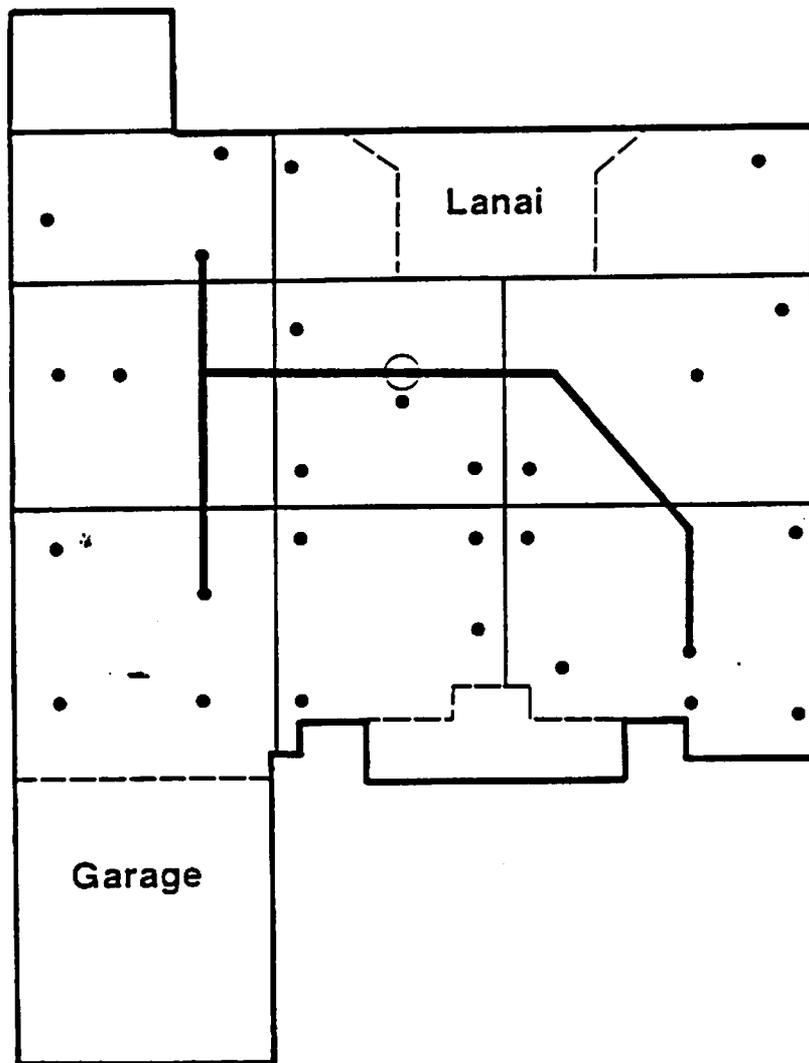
House #3 footprint, with mat layout, interior footer and measurement point location.
